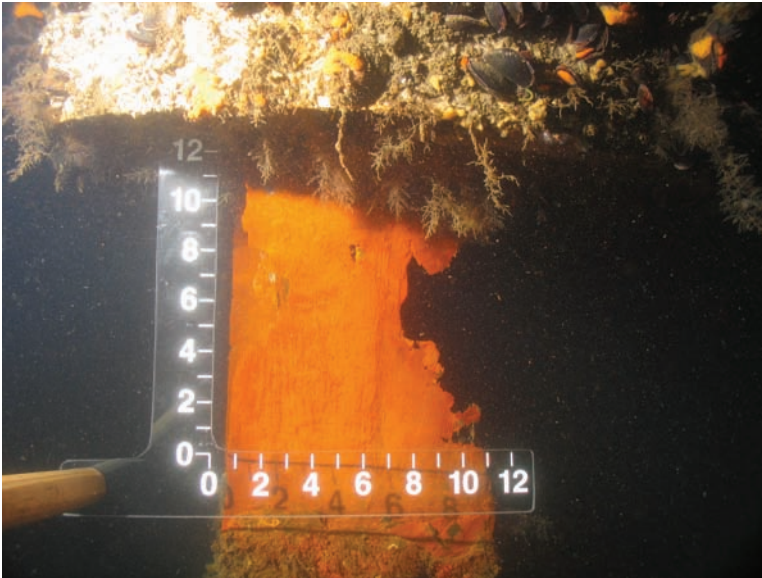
Severe galvanic corrosion of steel pile below concrete jacket
